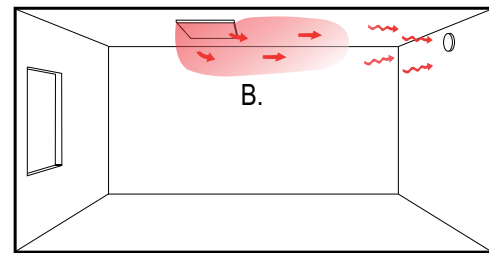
B = Supply air, ceiling - Exhaust air, ceiling. (Heated air
